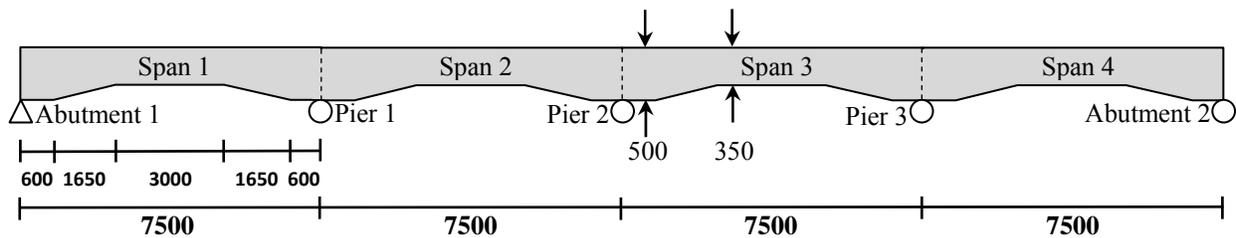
Elevation view of Canal Bridge, Cornwall – Original design with normal concrete (mm)
